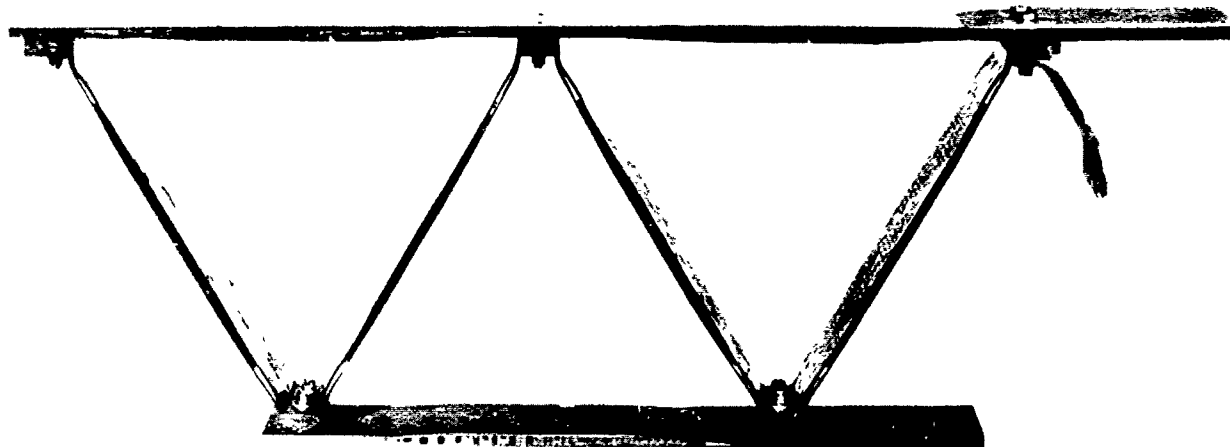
BOLTED TRUSS ACTION SPECIMEN OVERALL VIEW
